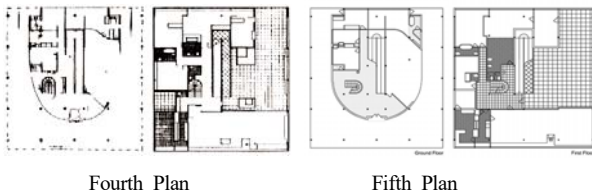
Fourth Plan & Fifth Plan(Final Plan) of Villa Savoye
